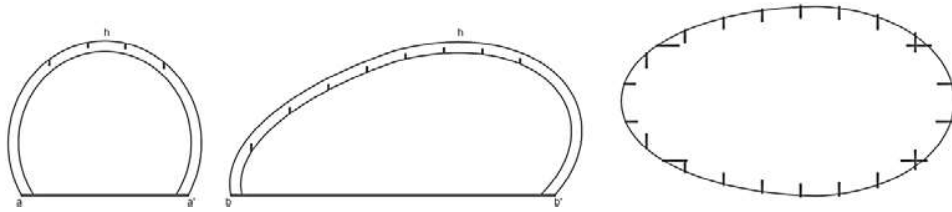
Structural plan: Transversal arch (left); longitudinal arch (centre); floorplan (right).
